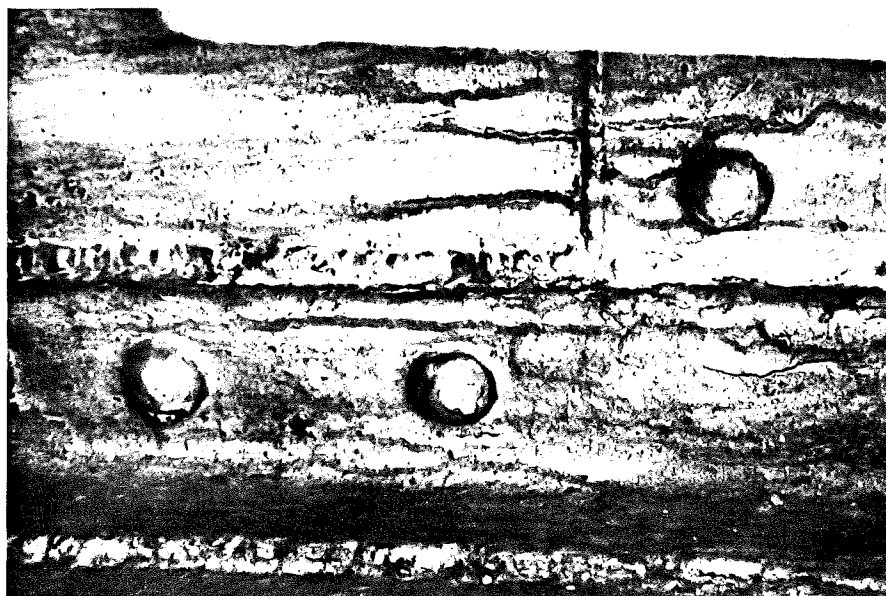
Close-up View Showing Longitudinal Weld to Flange Angle and Transverse Weld to Stiffener Angle
